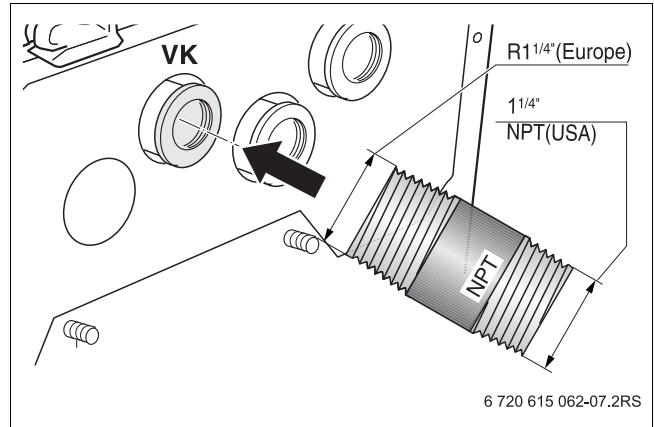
Measuring thread length on 1-1/4" conversion nipple
